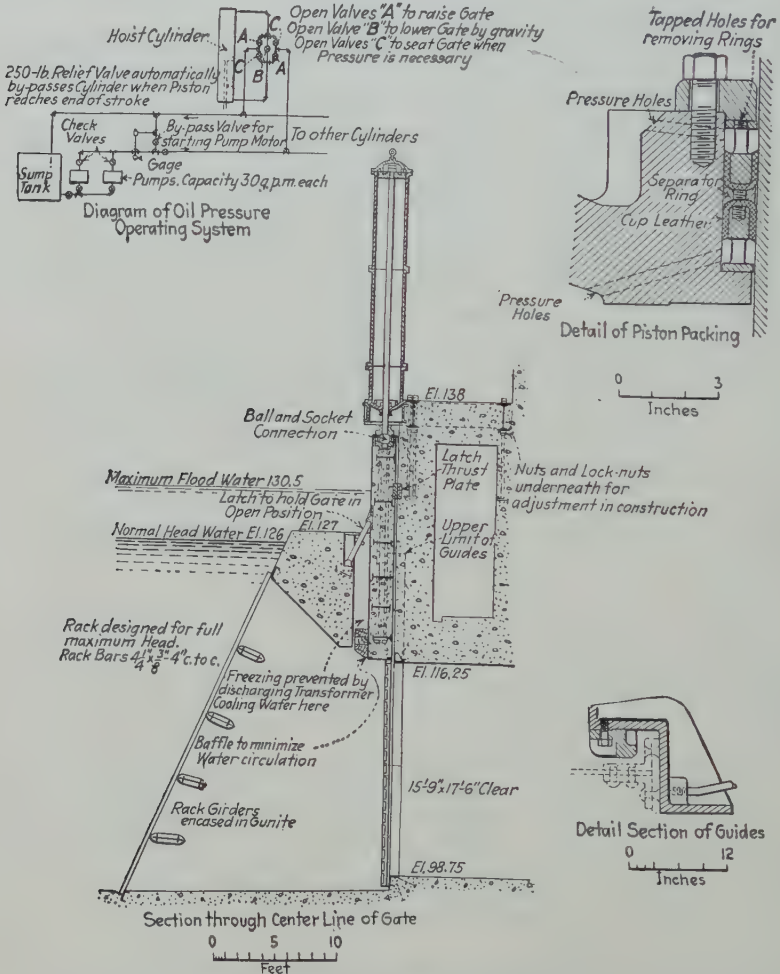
Concrete and steel headgates and racks—Vernon plant, New England Power Company.
